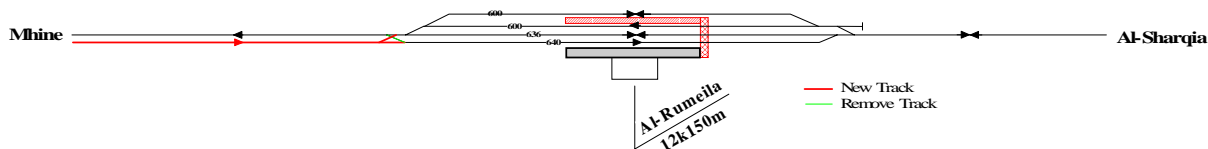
Sketch of Al-Rumeila station improvement track layout
